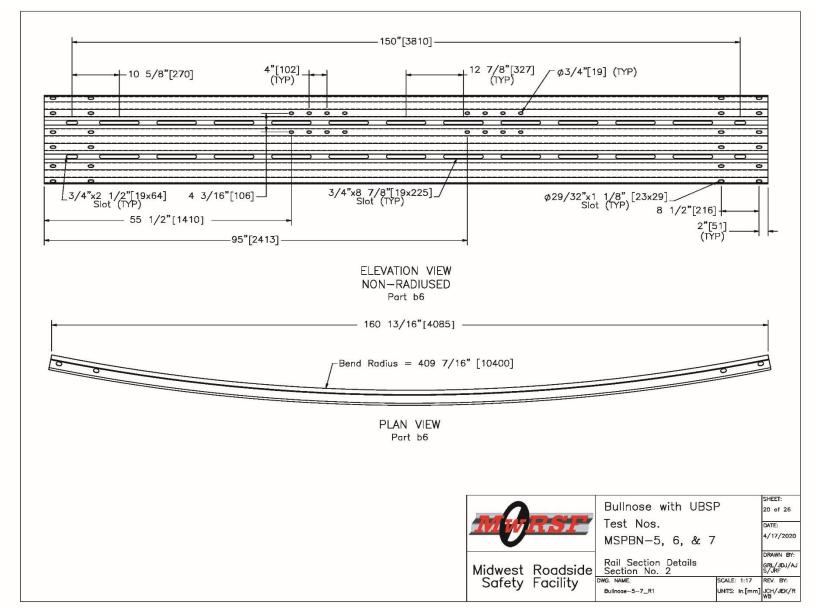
Rail Section Details Section No. 2, Test Nos. MSPBN-5 through MSPBN-7
